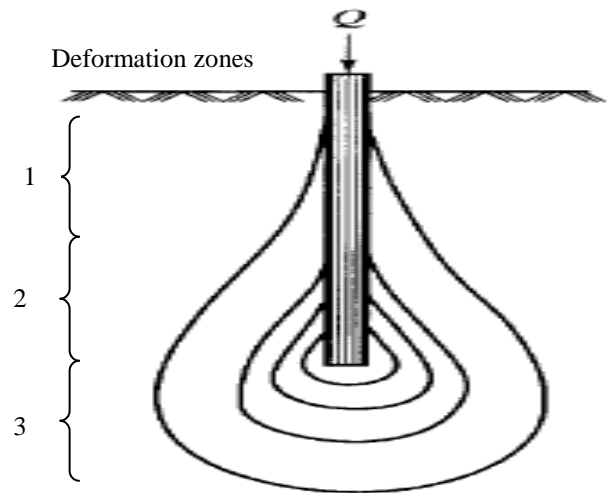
Failure bulb and Deformation Zones of a Single Pile
